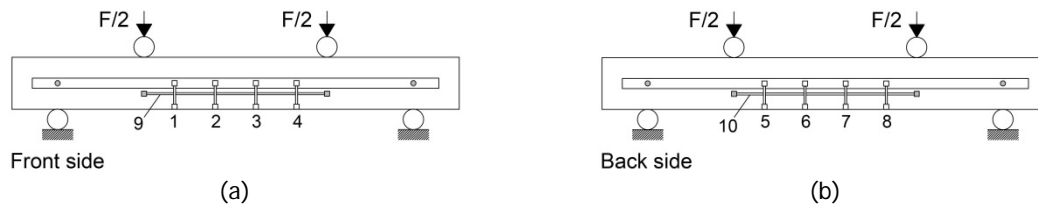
Positions of the LVDTs during the bending tests: (a) front side; (b) back side (e.g. for out-of-plane bending test, similar for in-plane test).
